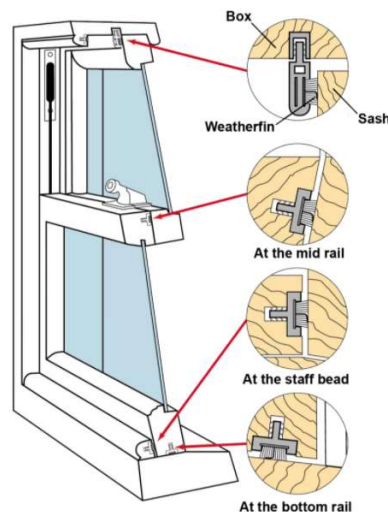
Image draught-proofing system (Ventrolla) to be employed
